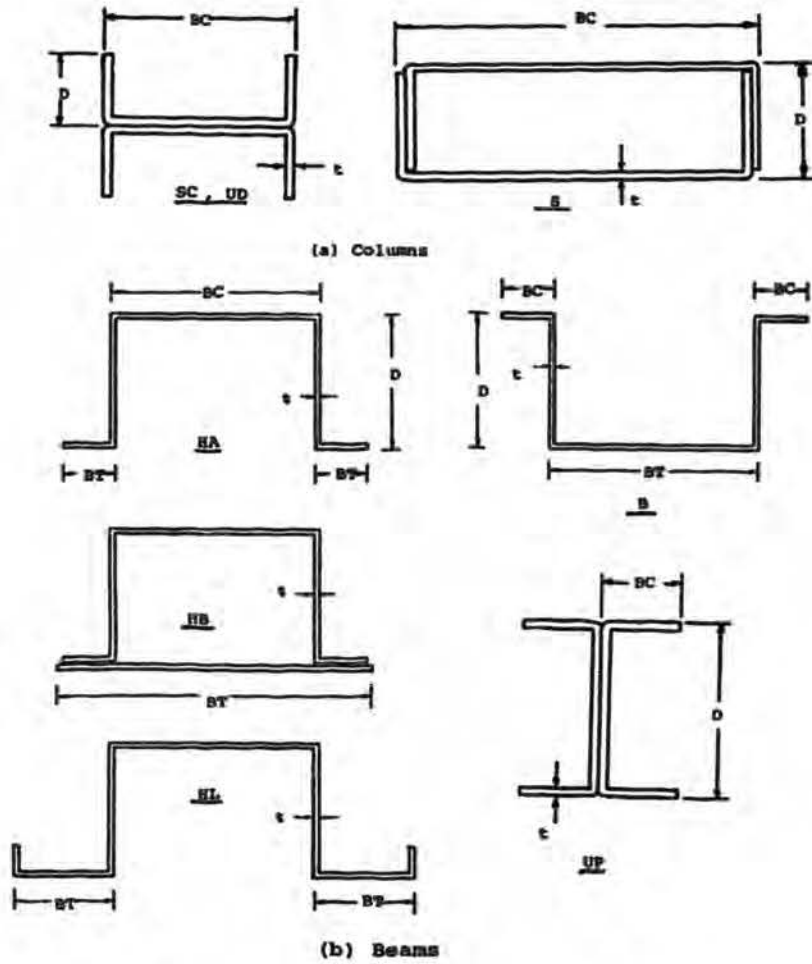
CROSS-SECTION OF TEST SPECIMENS
